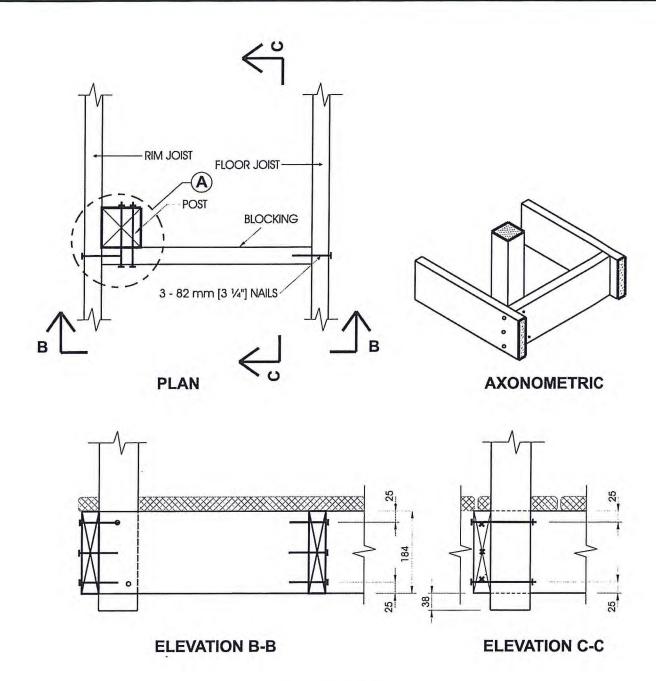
Exterior Connection: Post Bolted to 2 Floor Joists
